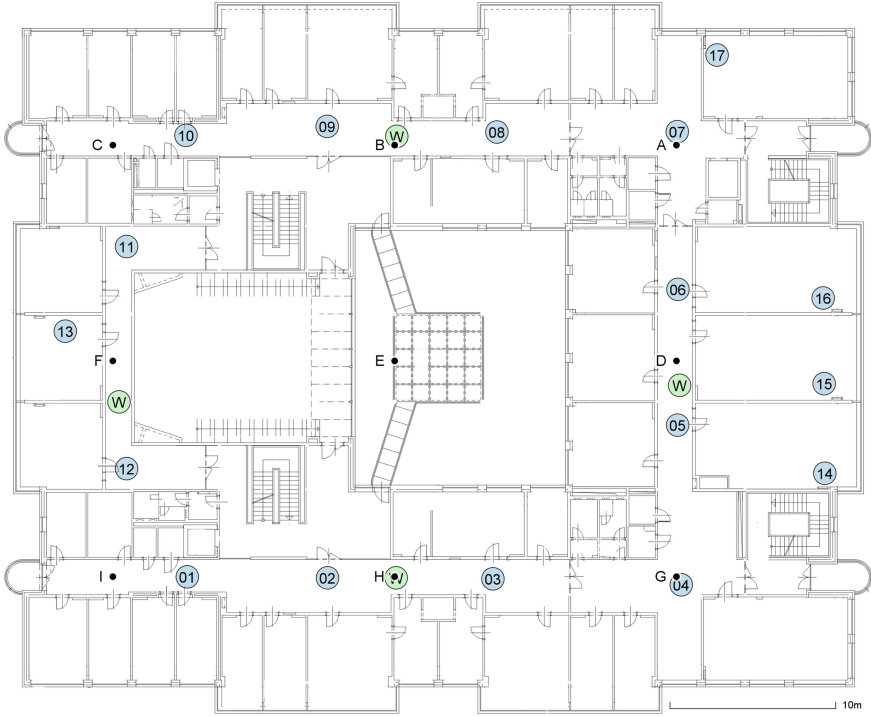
Floor plan with Wi-Fi access points, BLE beacons and testing points
